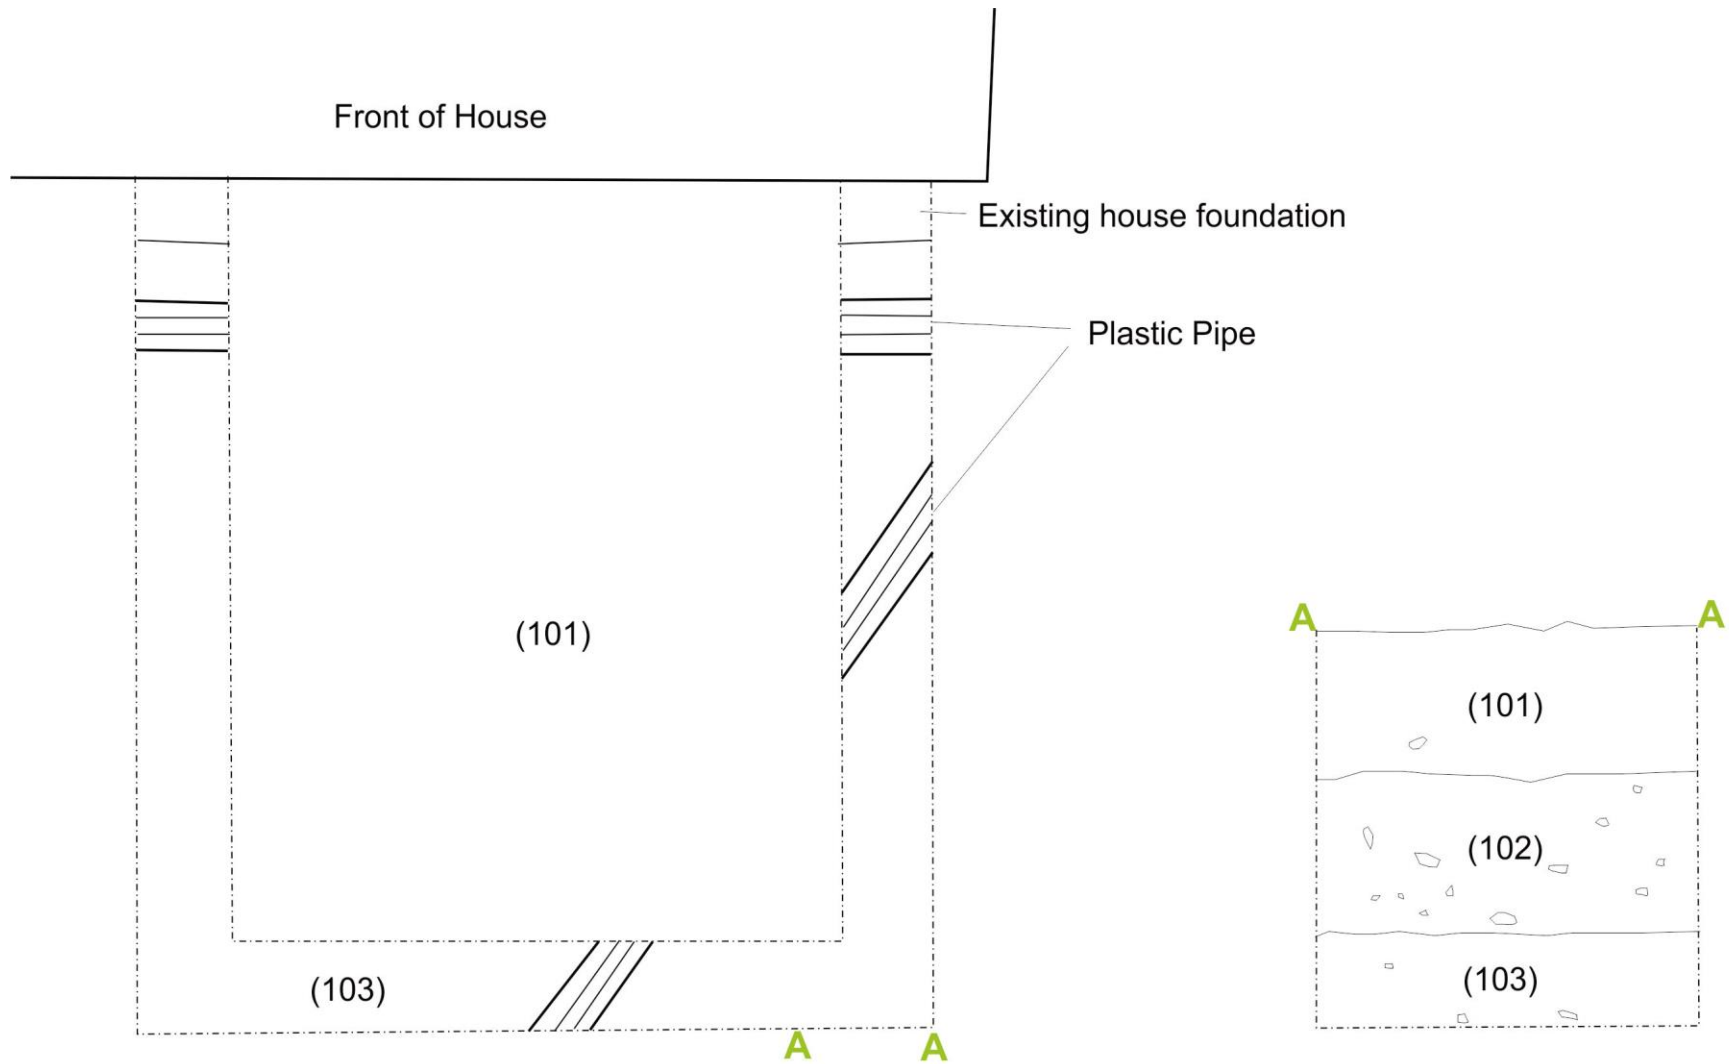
Plan and section of extension footings. Plan at 1:50 and Section at 1:20 @ A4.
